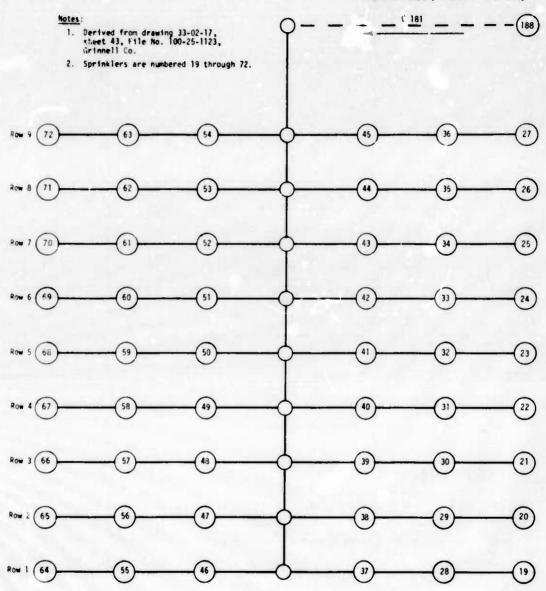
Sprinkler System in Building 783 at McClellan Air Force Base
